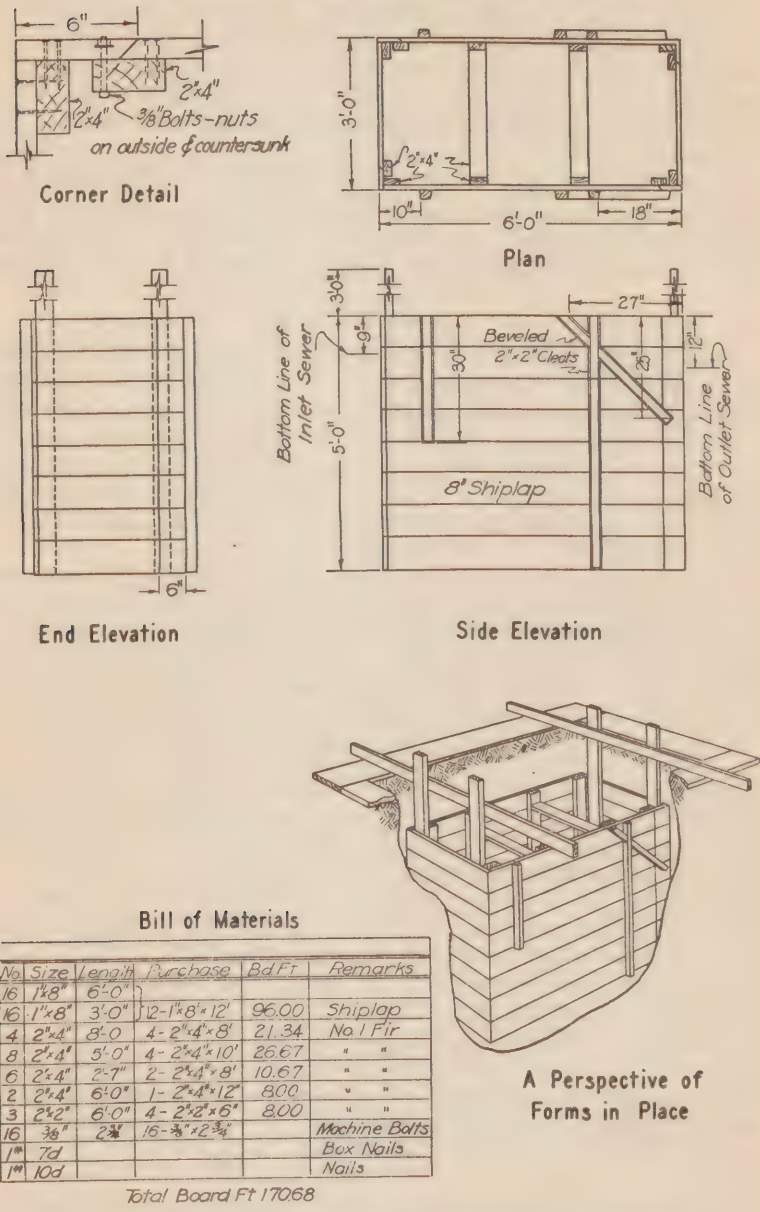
FORMS FOR CONCRETE TANK SHOWN IN FIG. 1
